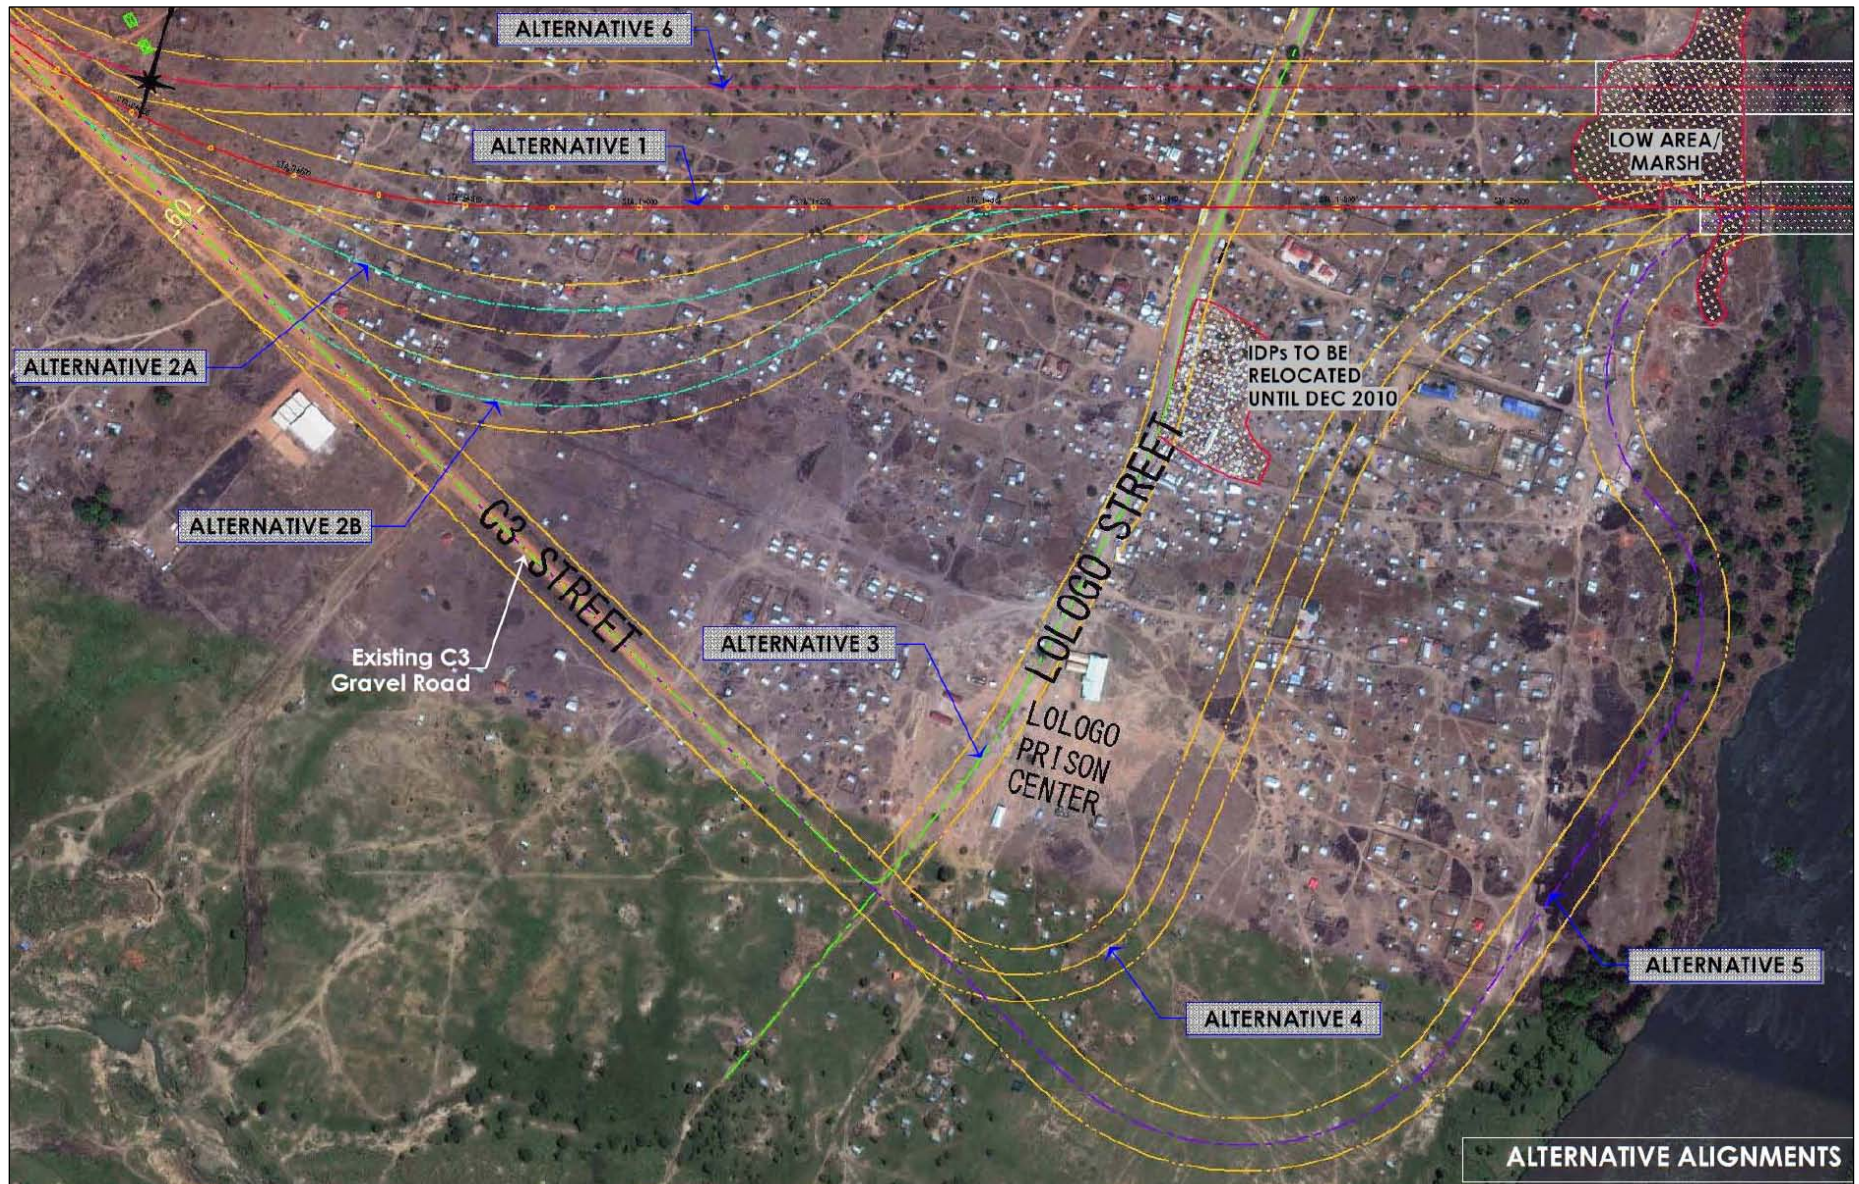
(2) Proposed Alternative Routes at Lologo Area on the West Bank
